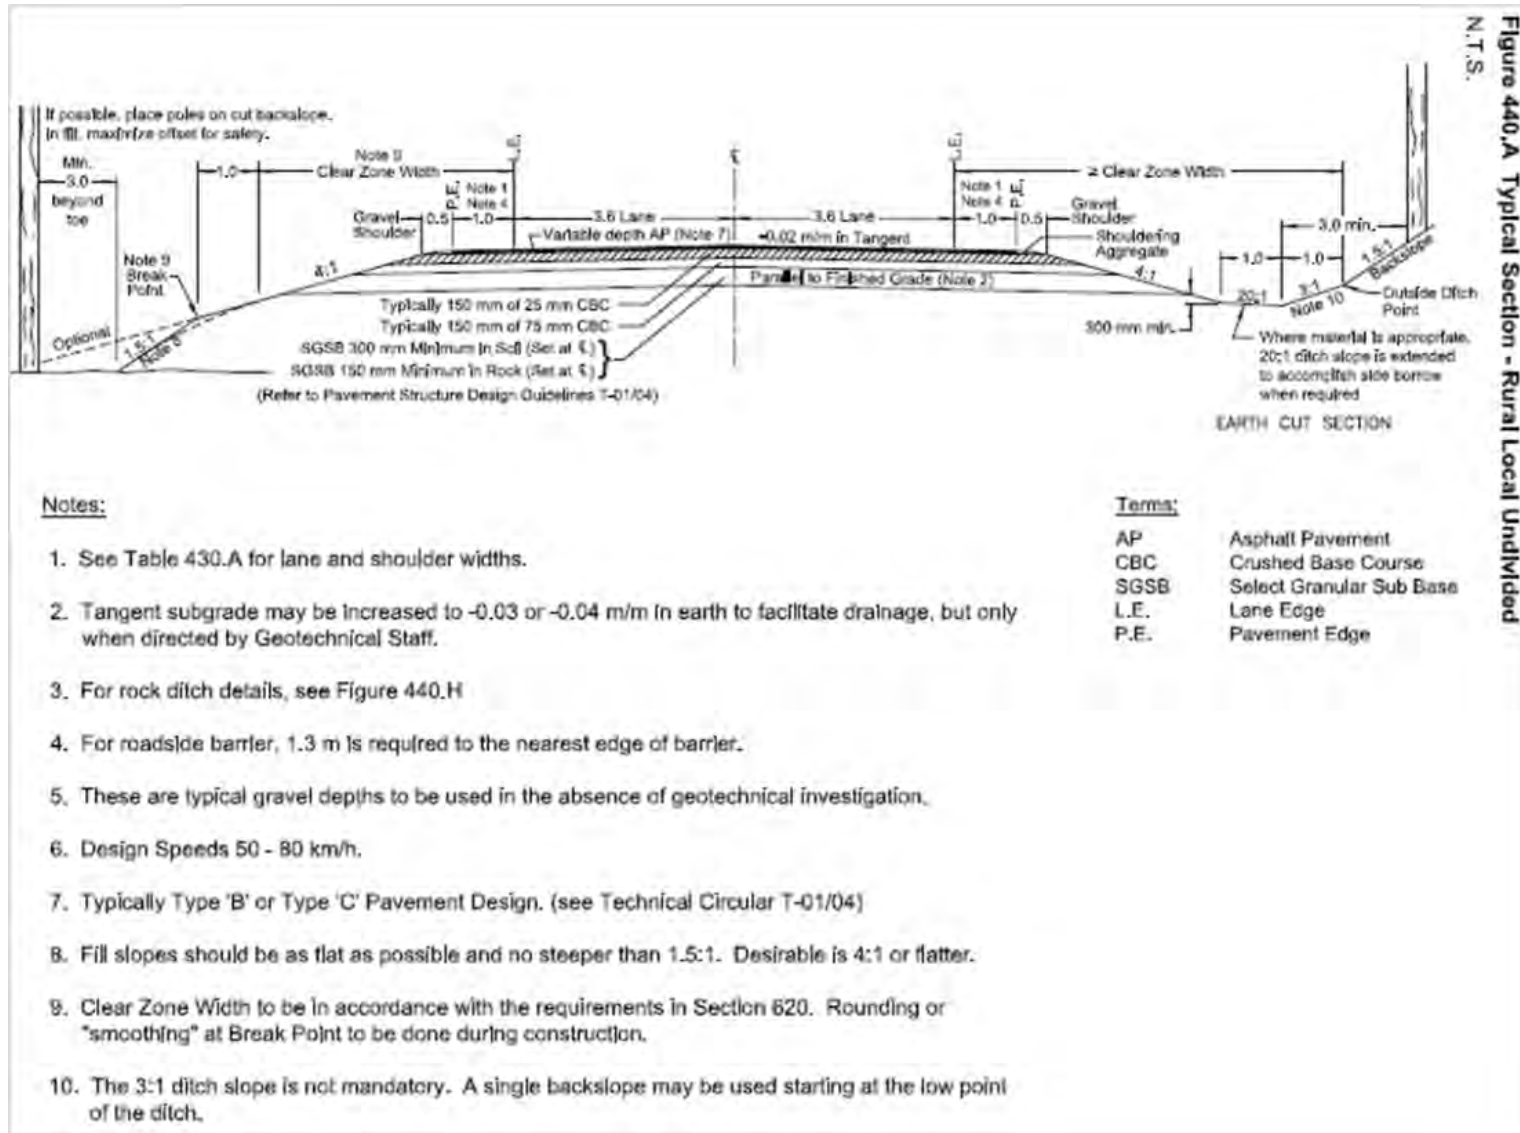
Typical Cross-Section for Ajax Mine Access Road
